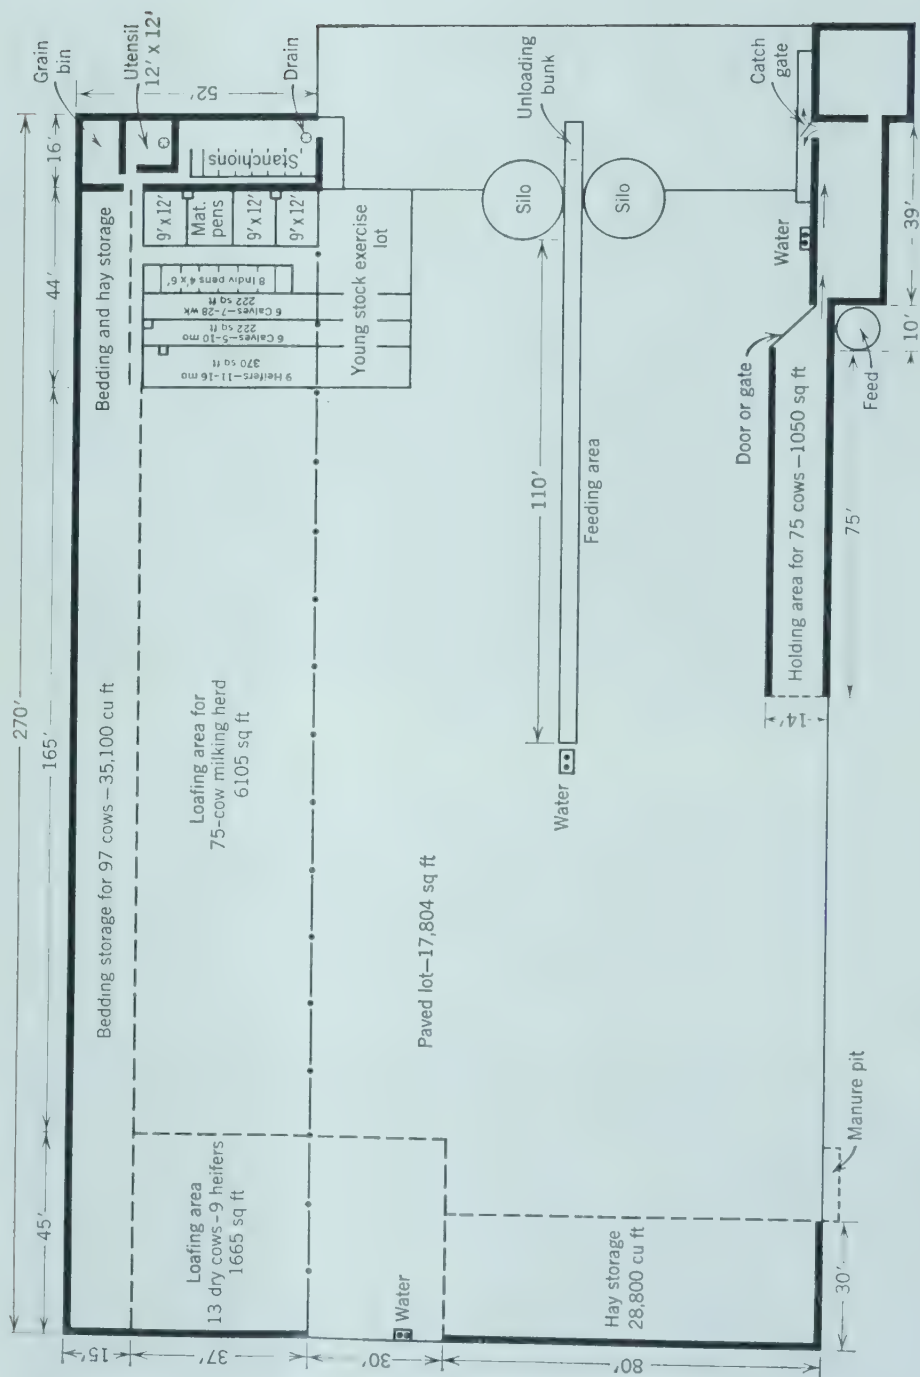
This loose housing layout was designed for 75 cows but can be expanded to 150 cows by adding a duplicate set of buildings and facilities to the right. A central milk room would be used. (Courtesy Babson Bros. Co.)
